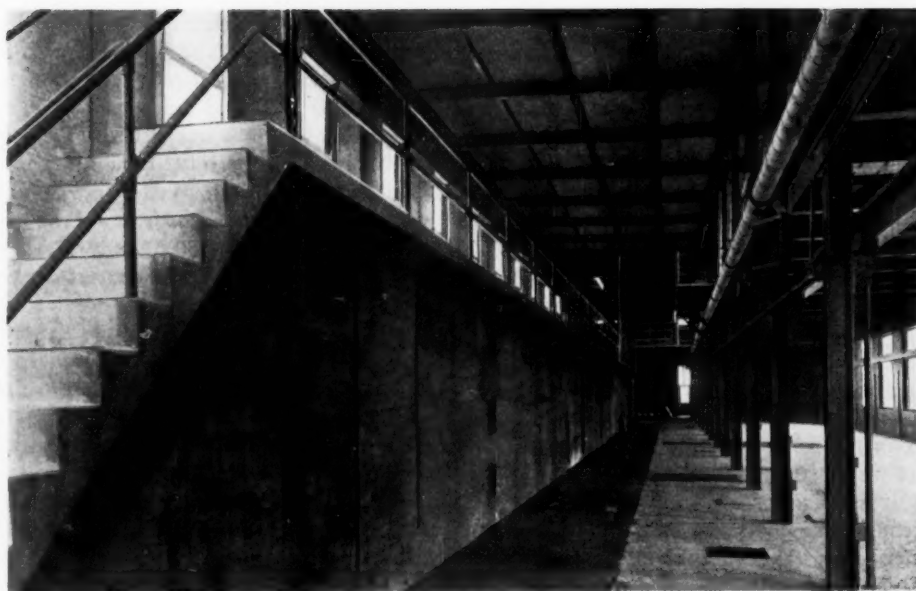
VIEW OF FIRST FLOOR OF LABORATORY FROM WEST END OF BUILDING
